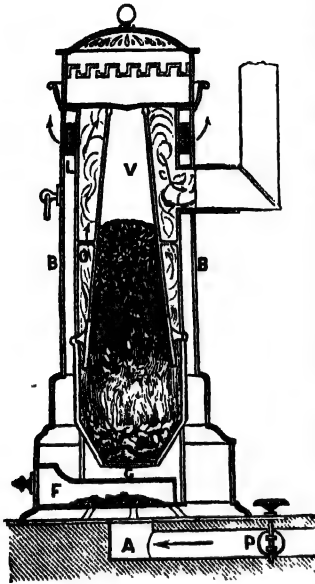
Section of Heating and Ventilating Stove. A, Inlet Air Pipe; B, Outer Casing; P, Valve; F, Ash Box; V, Fuel Space; G, Fire-bars; L, Hot Air exit.
